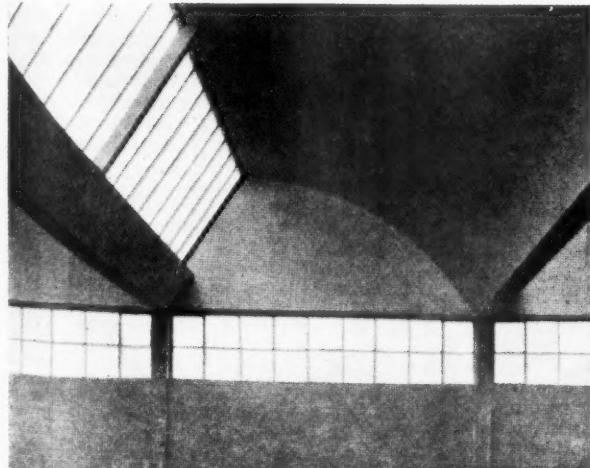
Clothing factory, Congleton, Cheshire. Shell concrete north-light construction. Architect: Rudolf Frankau
